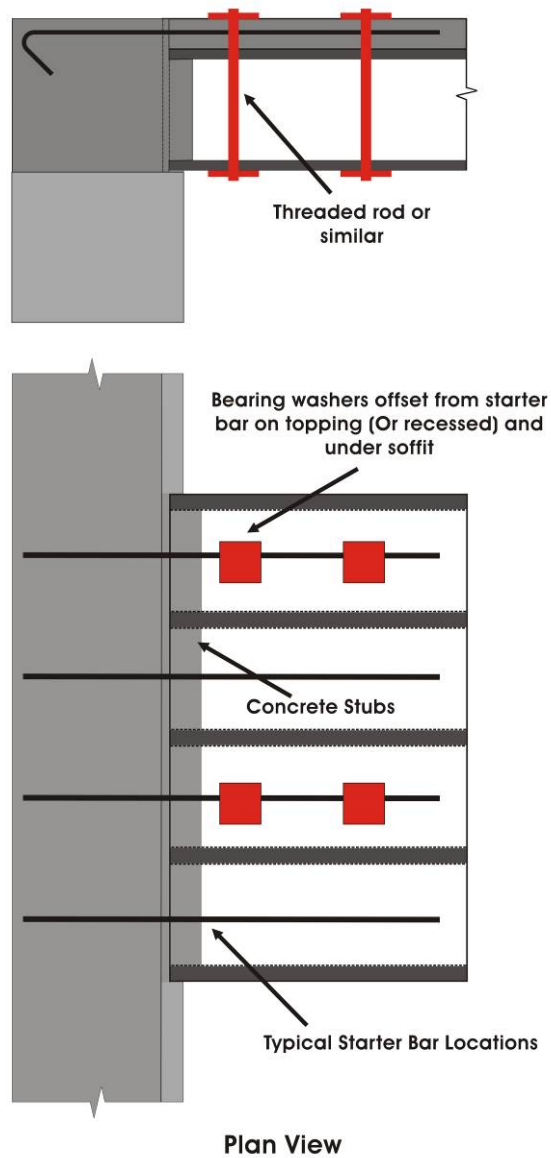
Potential layout of pseudo- transverse reinforcement
